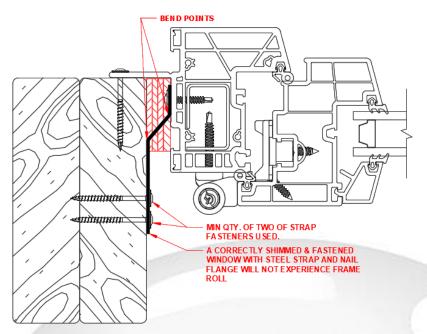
Jamb View Example of Correctly Shimmed & Fastened Window with Nail Flange & Steel Strap
